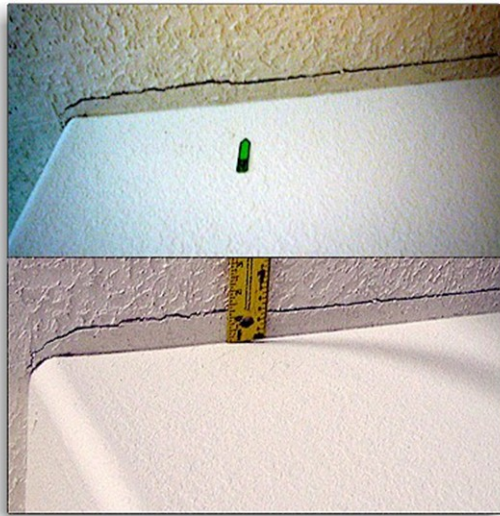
Cracks in a wall due to construction vibration, (http://vibrationdamage.com/understanding_vibration_damage.htm).
